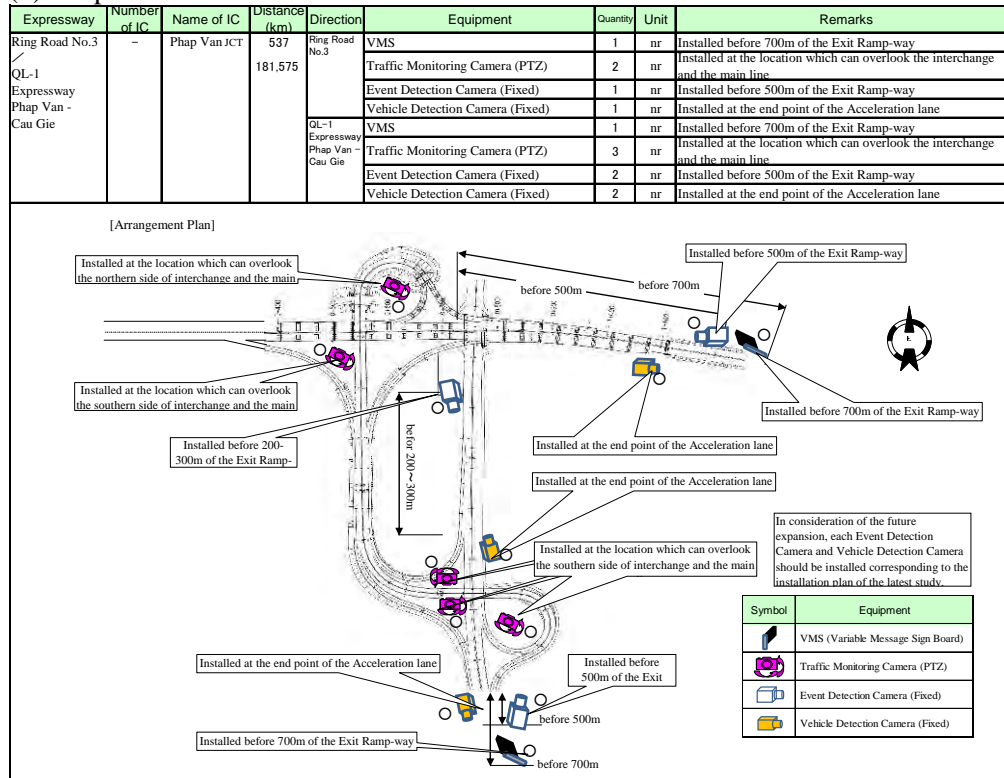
Equipment Layout Plan at Phap Van Junction
